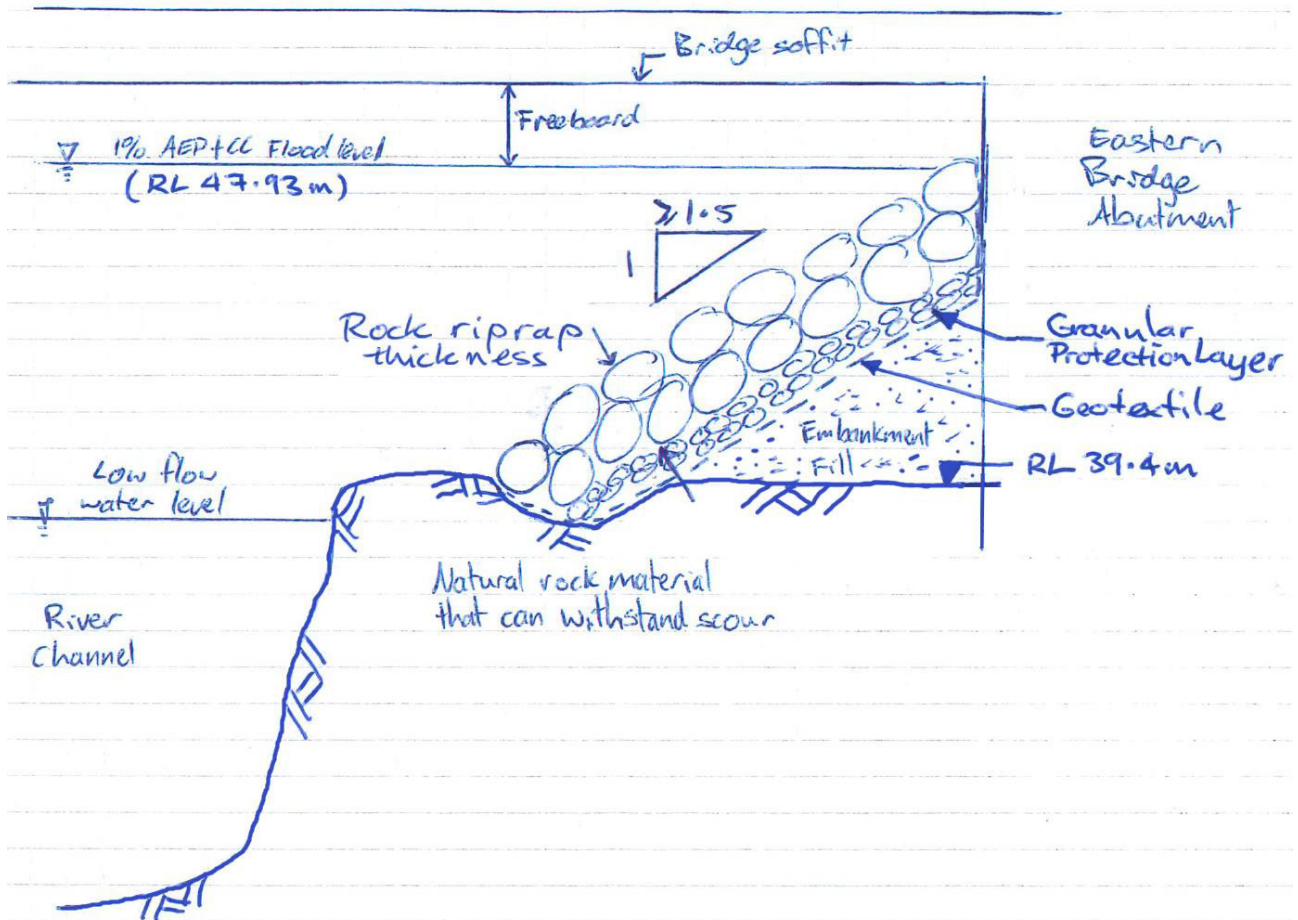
Sketch of rock revetment design at south corner of eastern abutment
